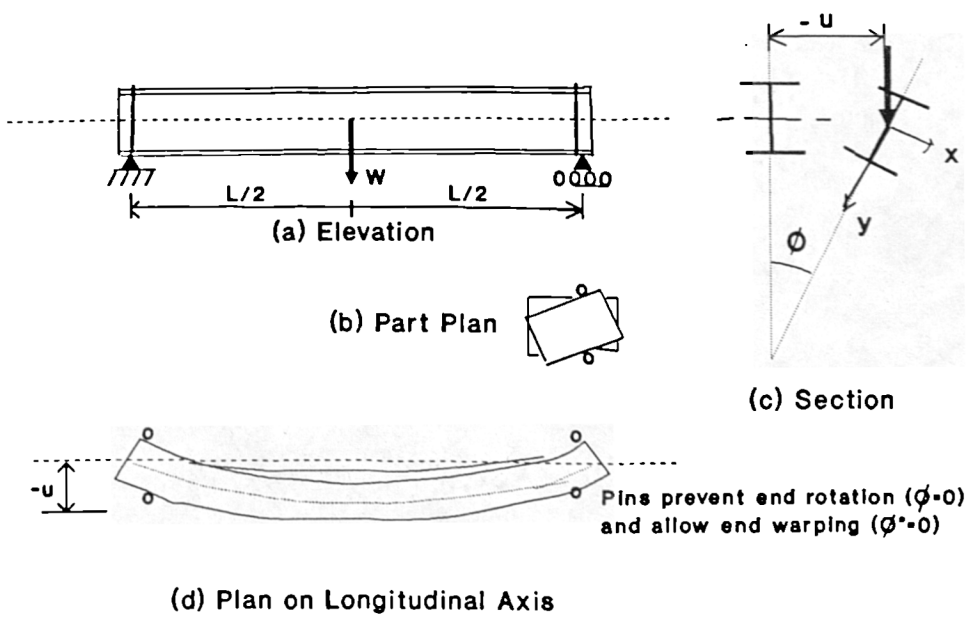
Buckling of a Beam with a Central Transverse Load
